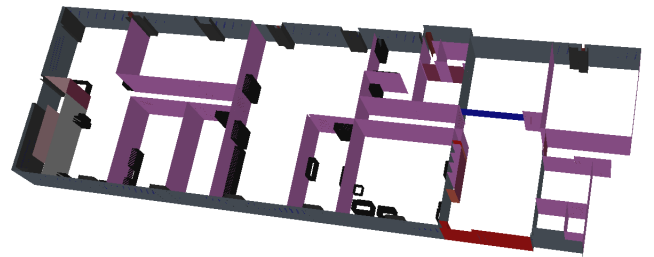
Top view of investigated rooms in the first floor of Siradel building.
